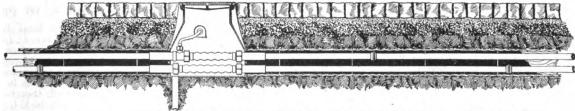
NEW INSULATING SUBWAY CONDUIT OF THE INTERIOR CONDUIT AND INSULATION CO.—SECTION.
